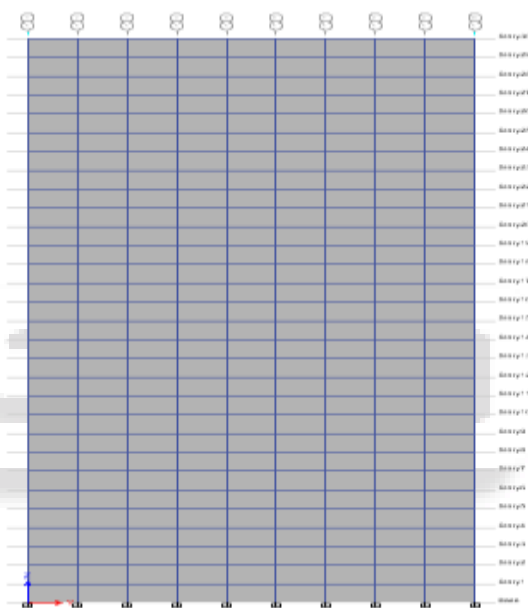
Elevation of 30 storey model showing Normal HRB.
